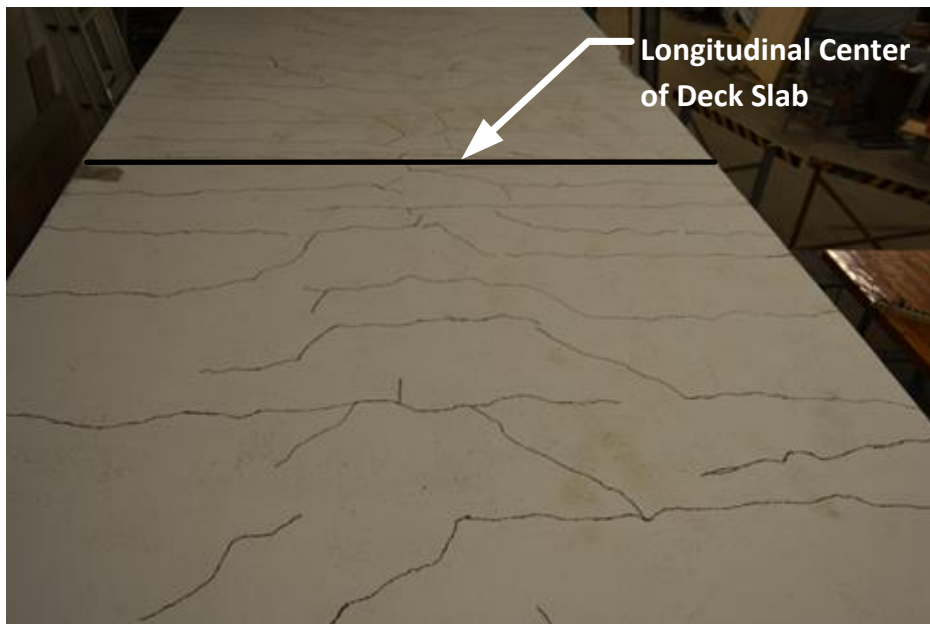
Final Crack Pattern in Top of Deck Slab Looking South (July 2014)
